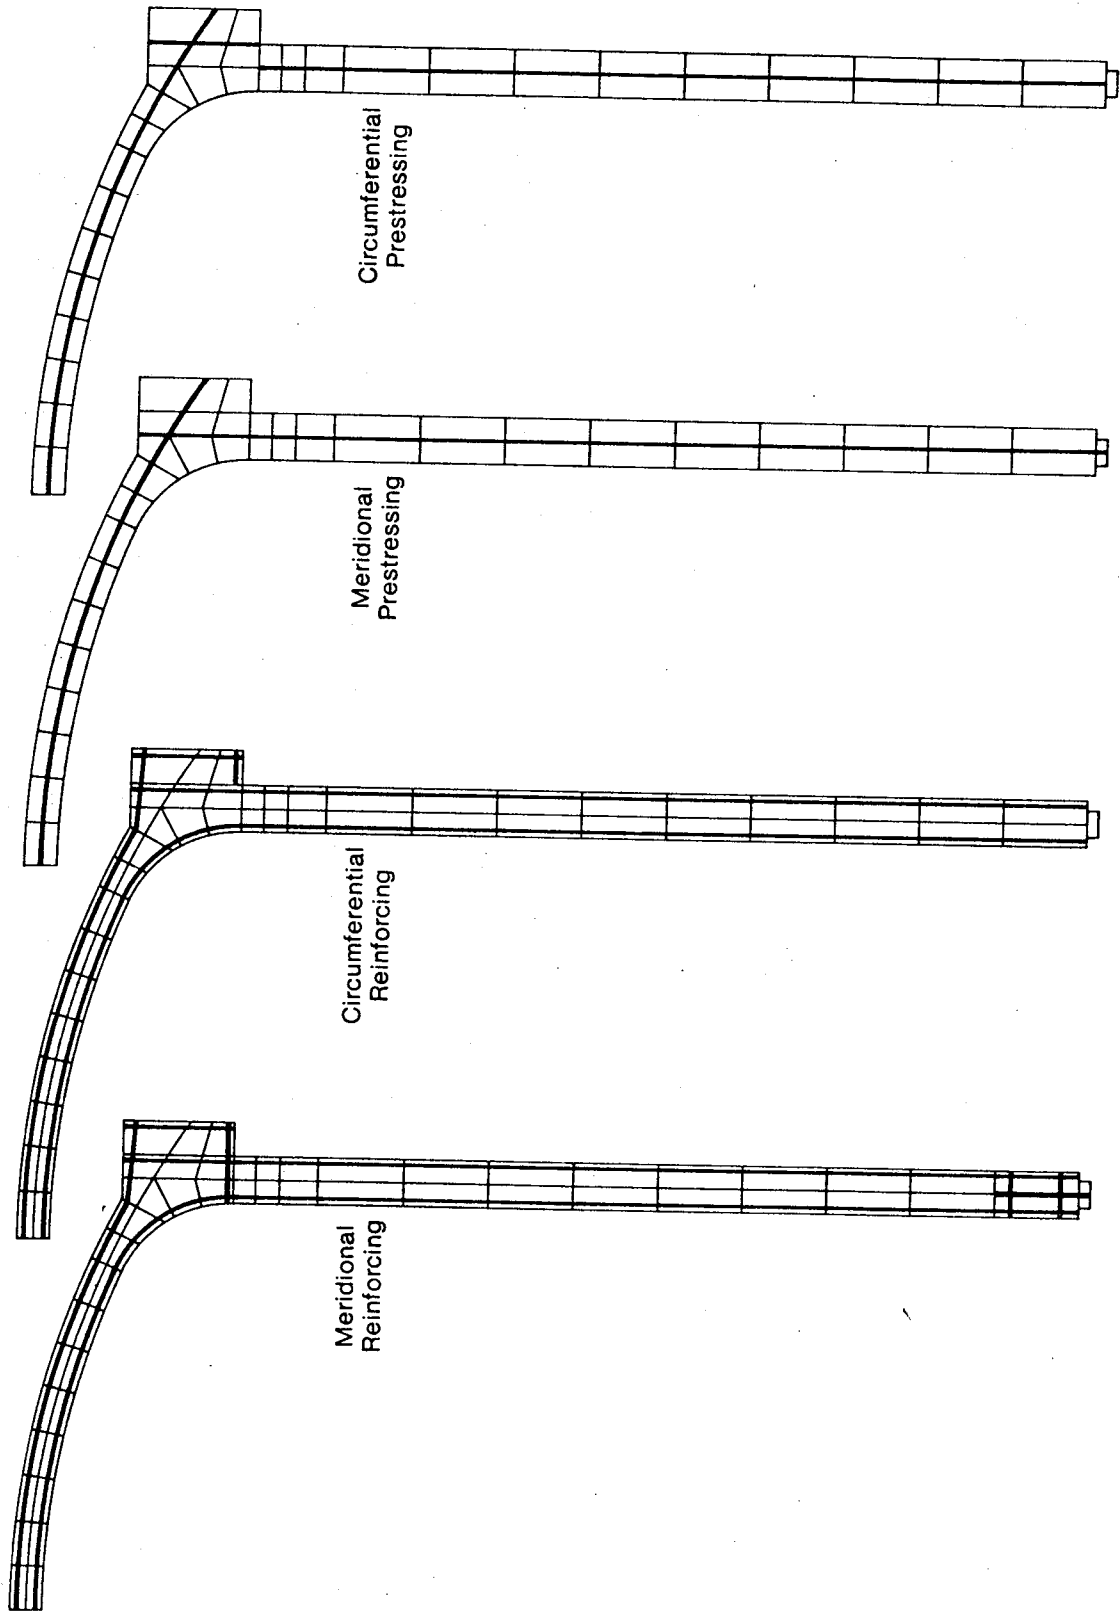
Reinforcing and Prestressing Layers of Finite Element Model
